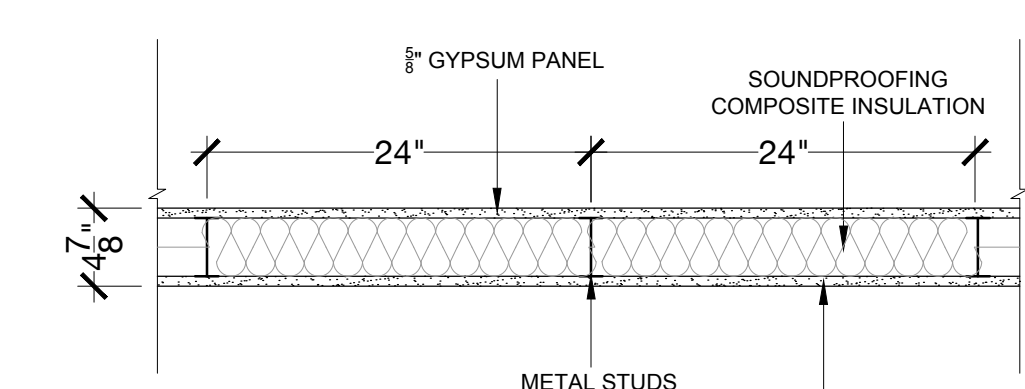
DEMISING WALL DETAIL - METAL STUD SYSTEM
